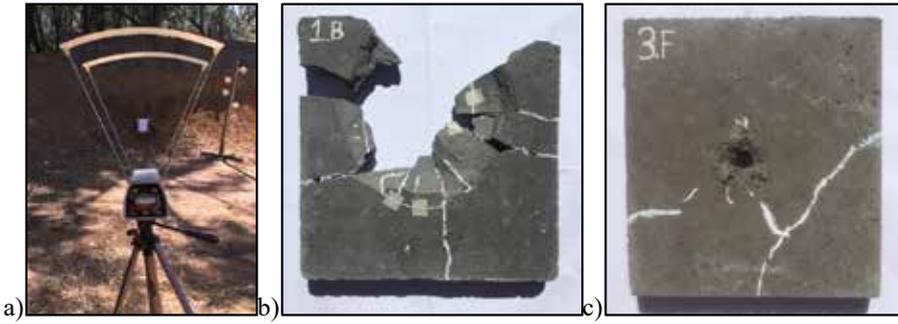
a) Prochron chronometer, b) unreinforced concrete panel, c) fibre reinforced concrete panel
